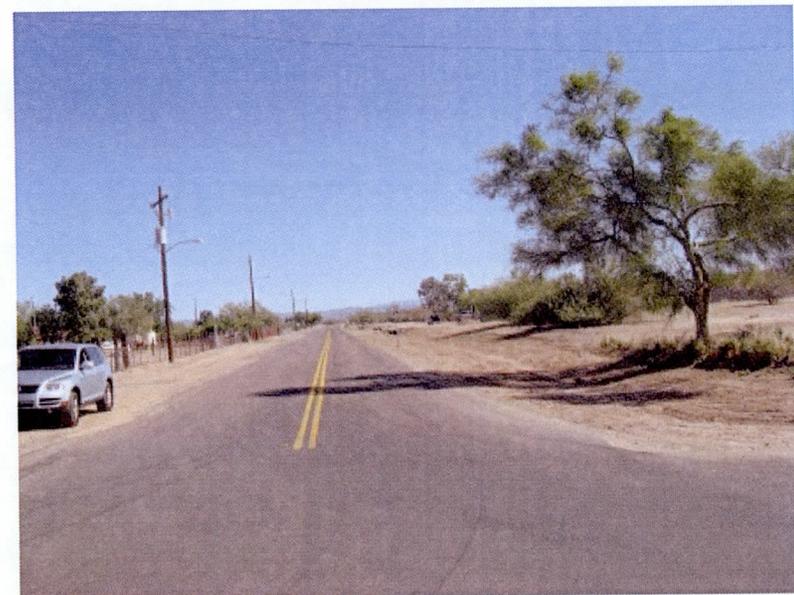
At the intersection of Citrus Road and Norwich Drive looking north at Citrus Road.
